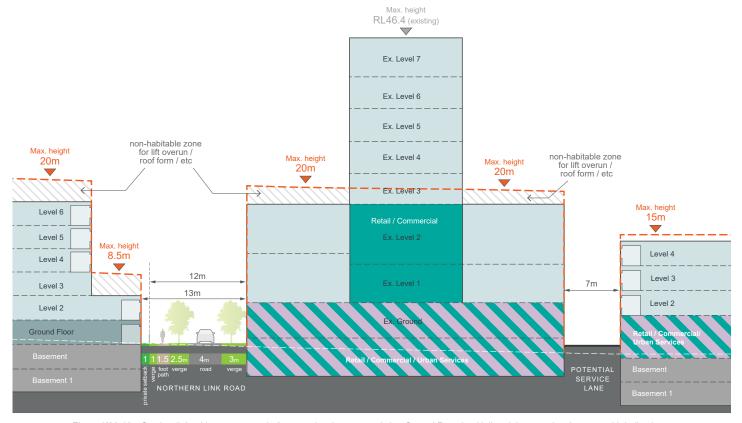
Section 5: Looking east towards 6 storey development, existing Central Roasting Hall and 4 storey development with indicative potential locations of urban service uses
